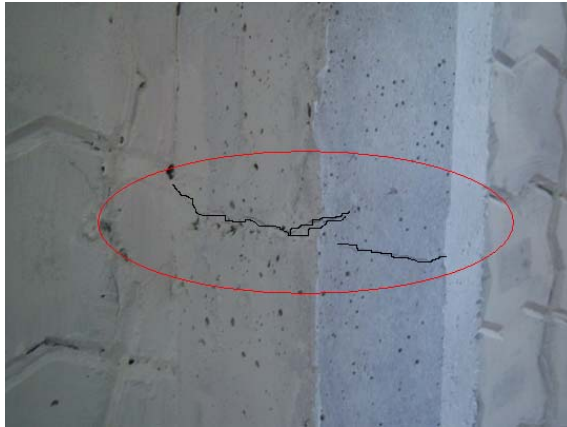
Cracks on the First Story beam of the Right Frame
